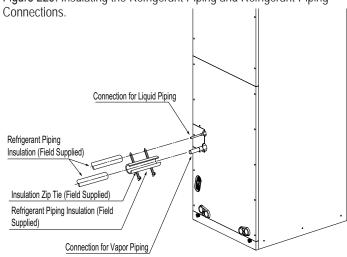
Insulating the Refrigerant Piping and Refrigerant Piping
